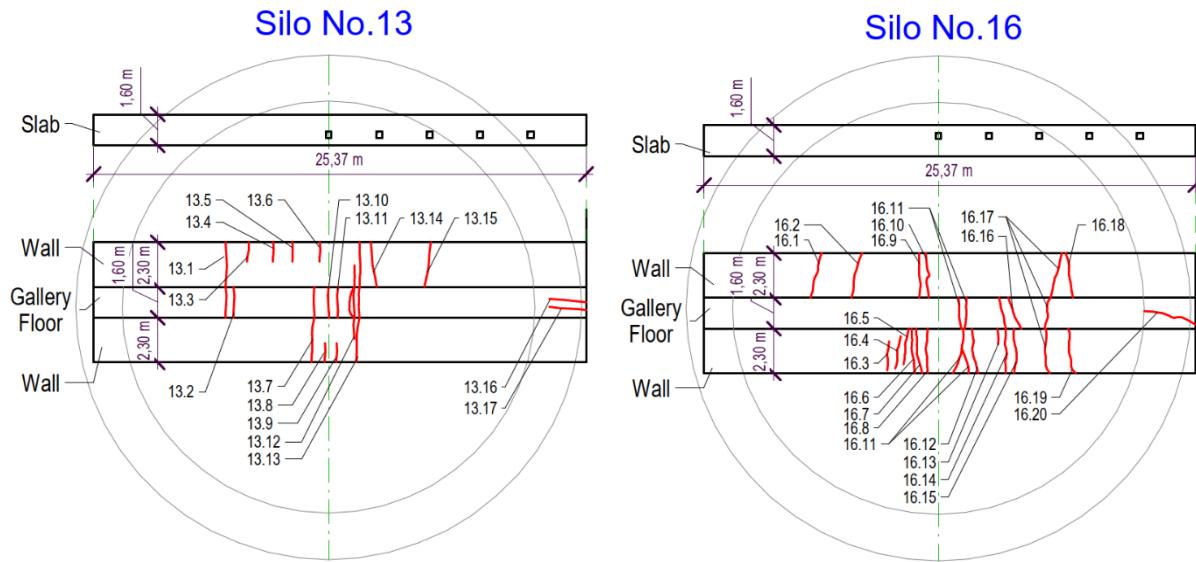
Crack layout of the underground gallery for silos No. 13 and No. 16
